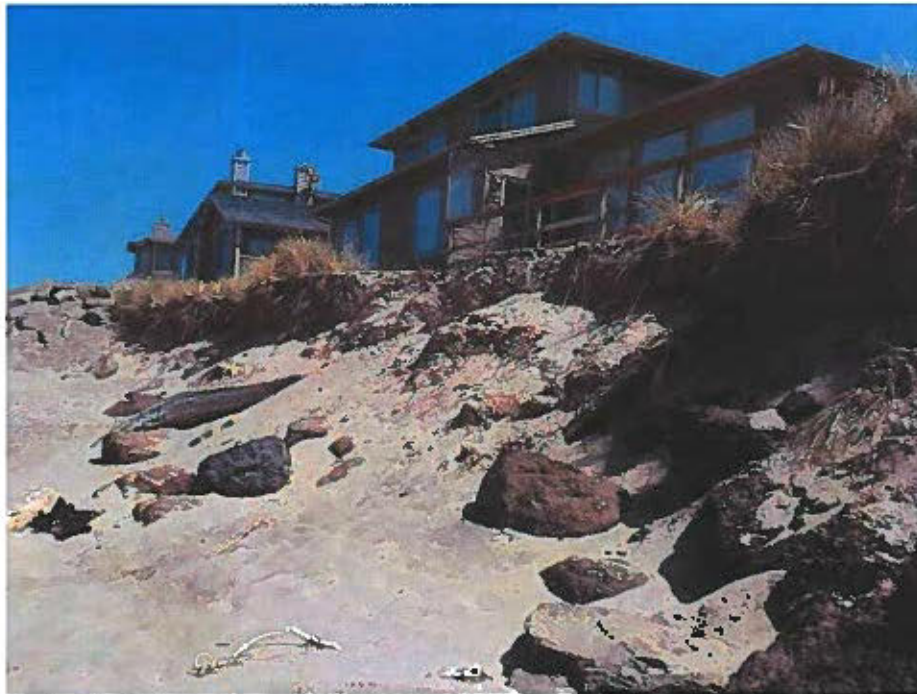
View of the erosion scarp and damaged revetment fronting Tax Lot 900, Map 08-11-03CB. Note the inadequate size and poor quality of the armor stone of the damaged revetment. (Also see Appendix A-2)
